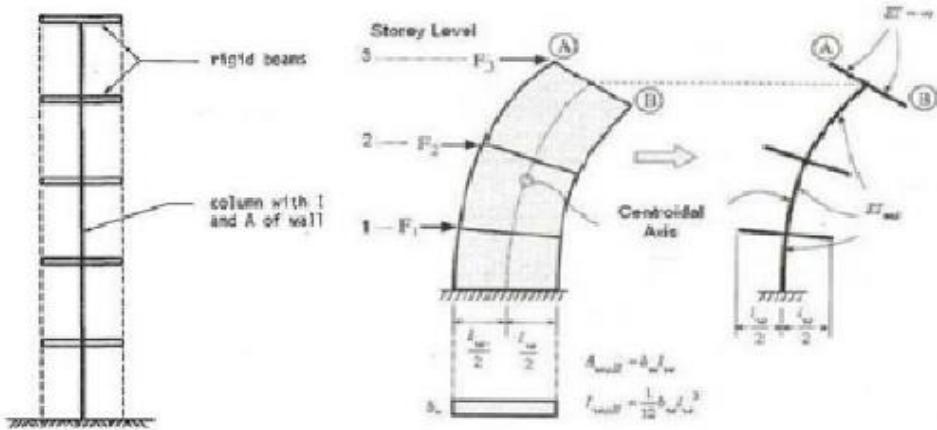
a) Wide Column Analogy, b) Equivalent Beam Element Model
